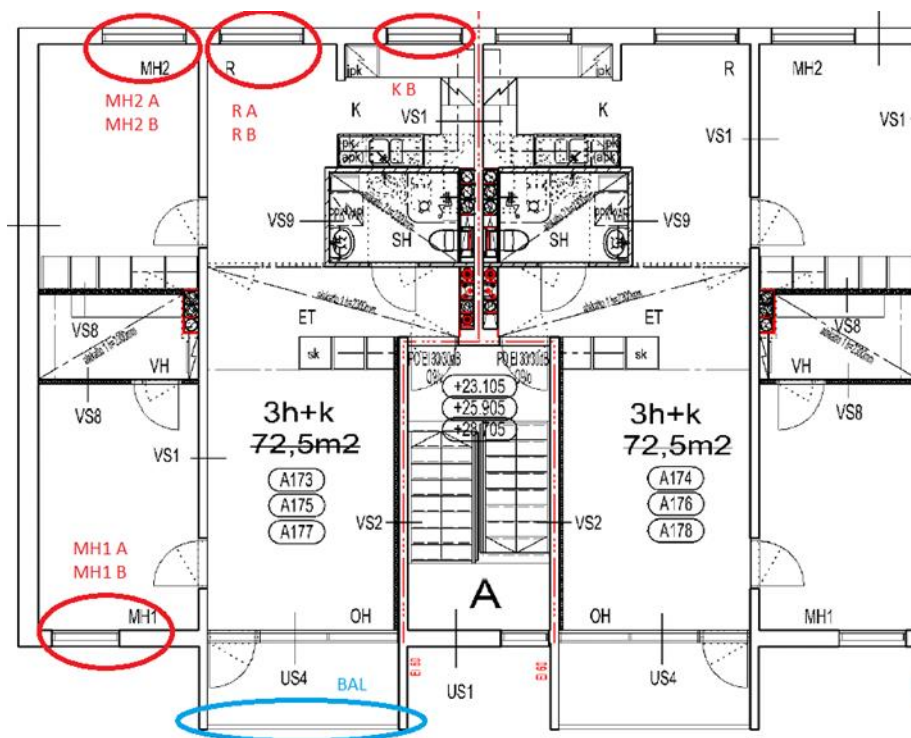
Floor plan of the Finnish pilot apartment (the left one) including positions for the louvers. The kitchen window (K B) had no louver installed as it is a tiny one.
